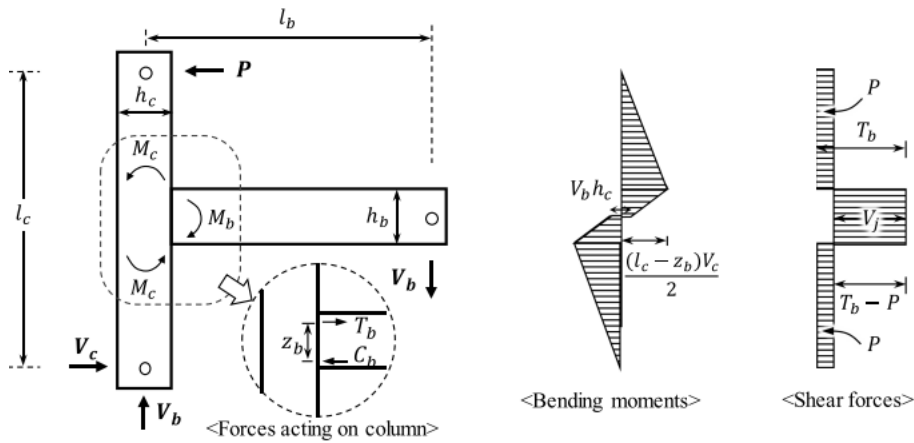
Internal Forces and reaction forces acting on exterior beam-column connections [4].
